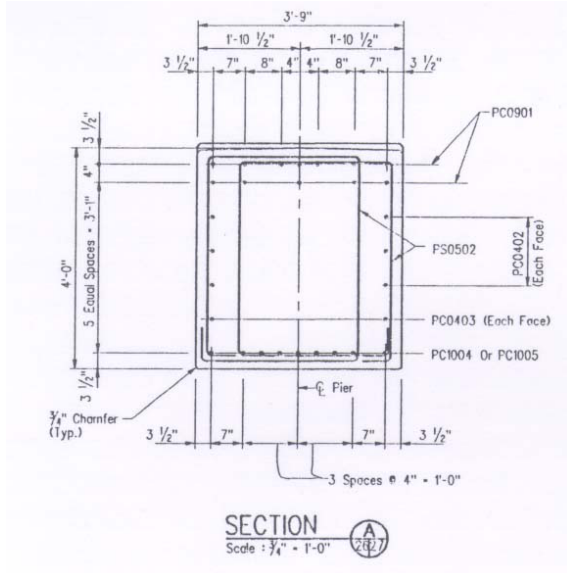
The actual pier cap beam cross section [Brown, 1993]. The  $\frac{3}{4}'' = 1'-0''$  scale is no longer correct.
